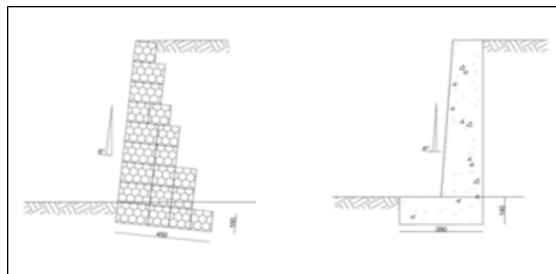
Graphic representation of wall in gabions (left) and concrete (right)
